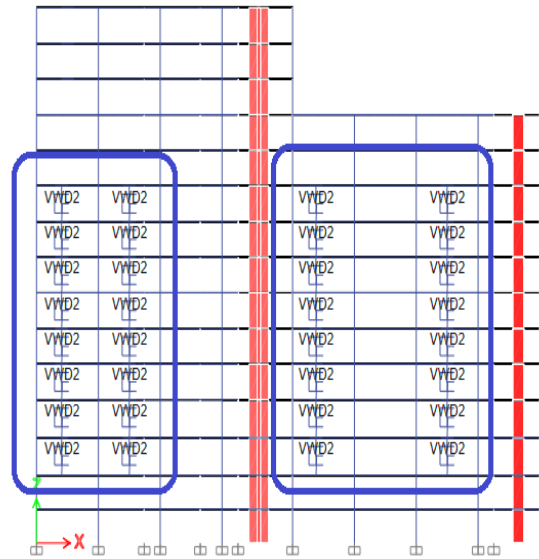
ETABS, Typical Elevation in X with Dampers – VWD2
